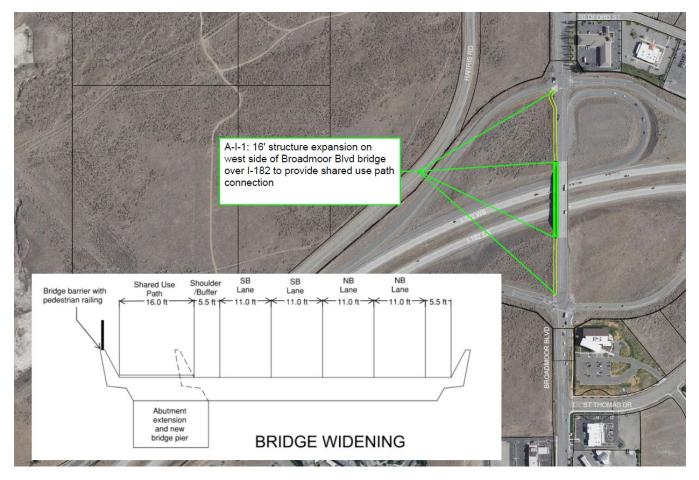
ALTERNATIVE A-I-1 (BROADMOOR BRIDGE WIDENING) CONCEPTUAL LAYOUT
